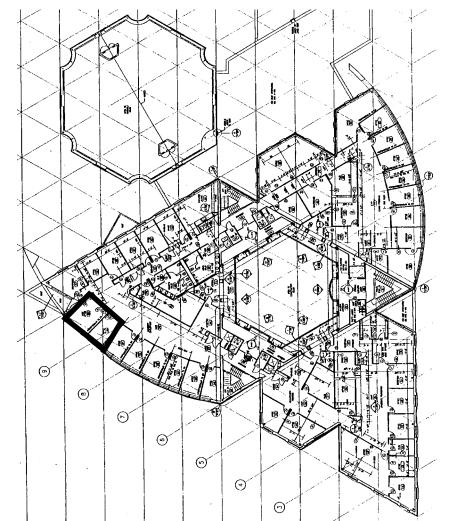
Floor plan of the second floor of the Alumni Center with the studied rooms highlighted with black box.
